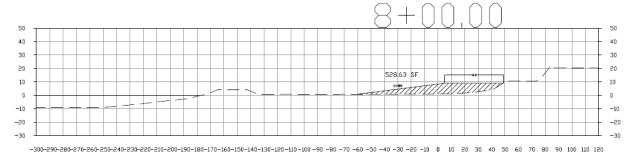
(d). Typical beach fill cross-section at Sta 8+00
